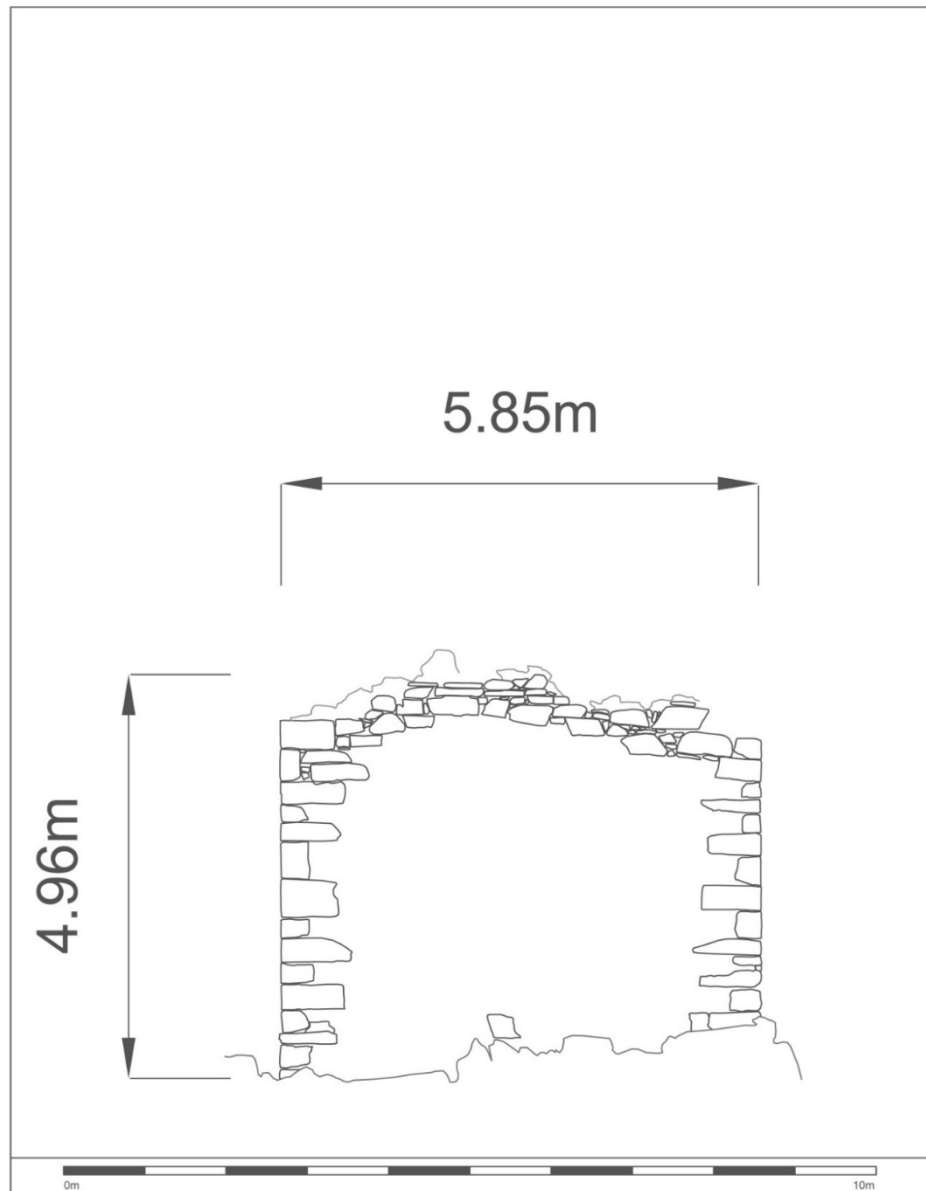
External elevation of the east wall of Clare Island Signal Tower.
